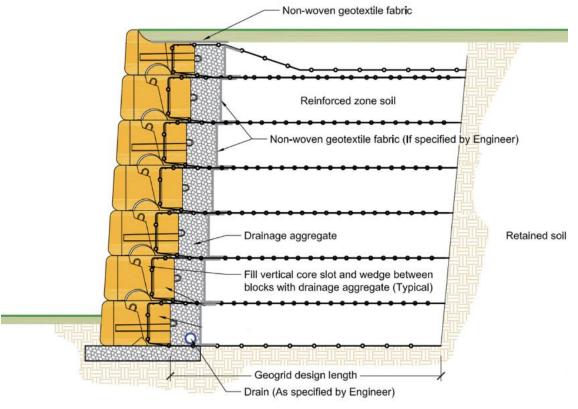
Use of non-woven geotextile separator for drainage column - PC system
